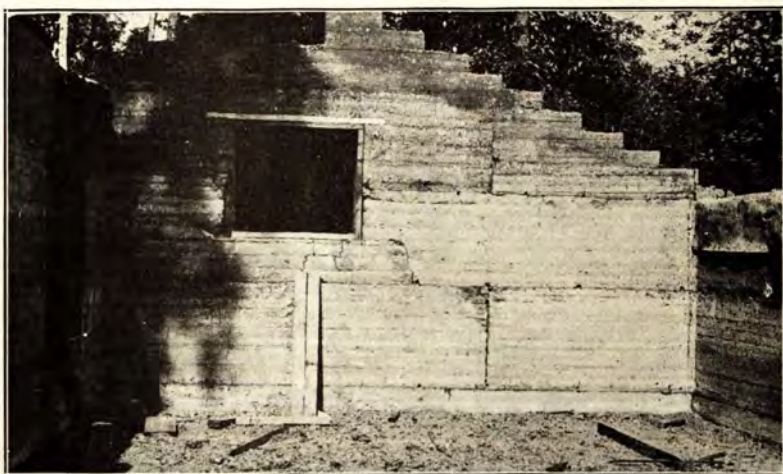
THE FINISHED WALLS OF THE RAMMED EARTH POULTRY HOUSE.
